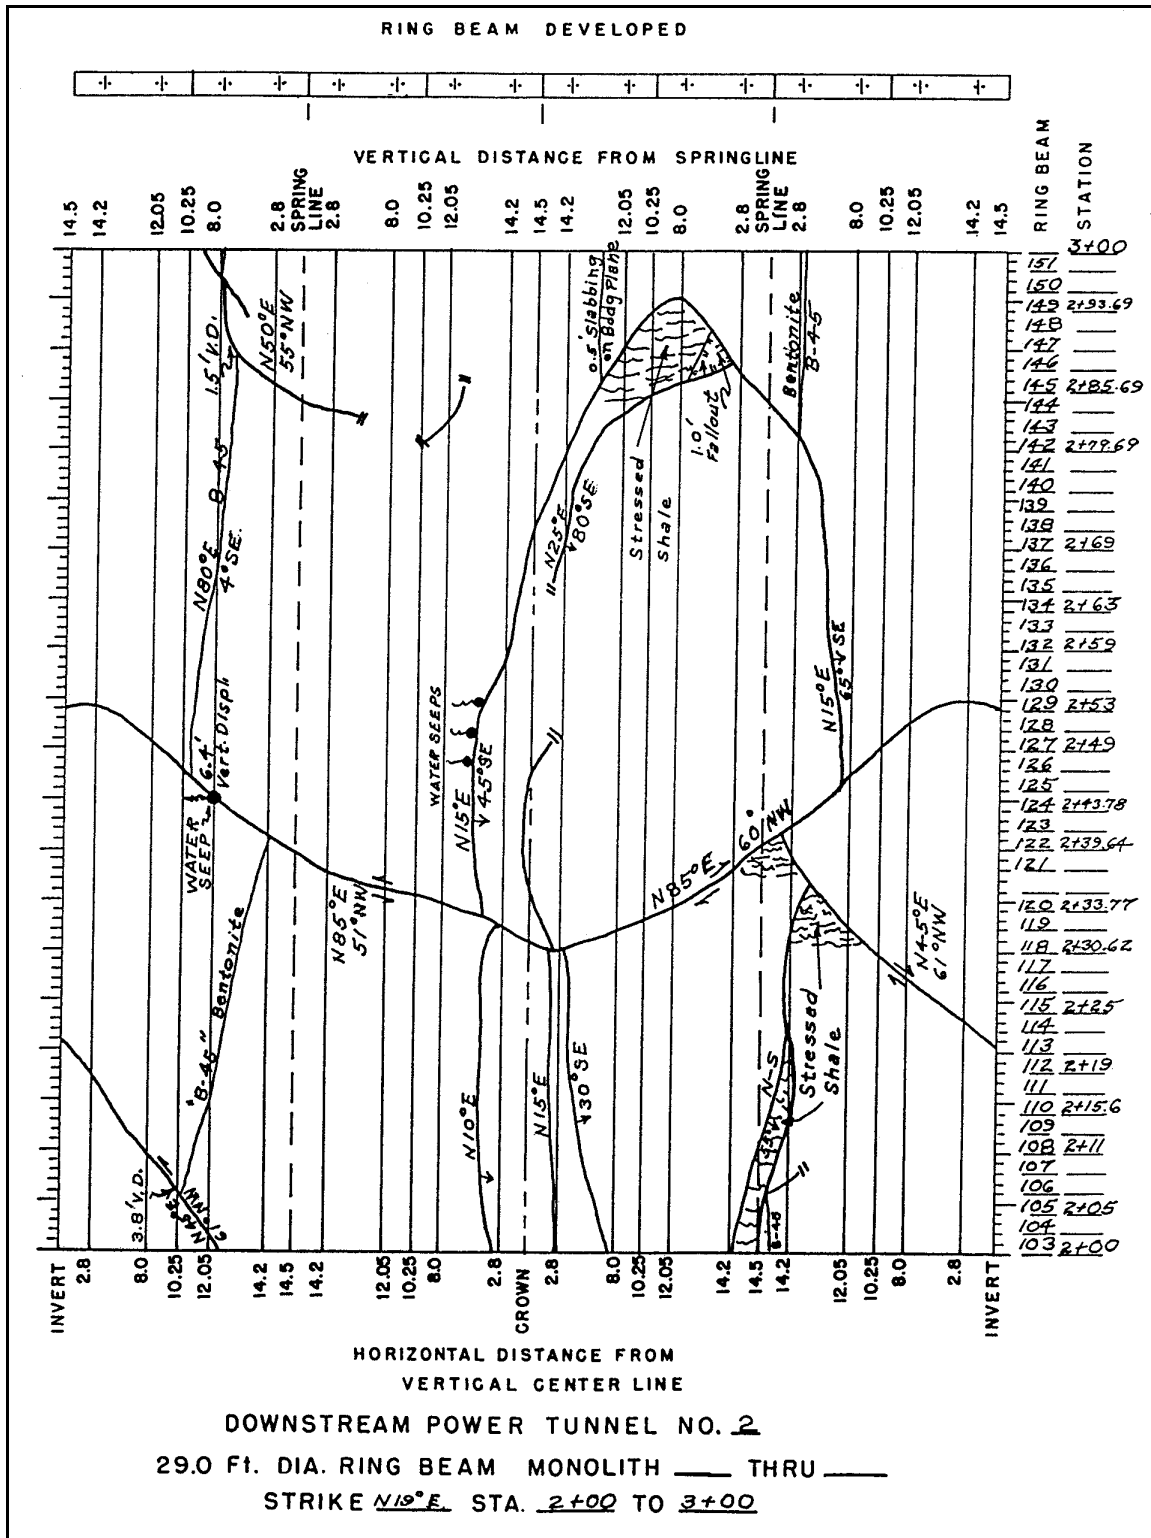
Developed plan of cylindrical tunnel section Oahe Dam, South Dakota (note: 1 ft = approx. 0.3 m)
